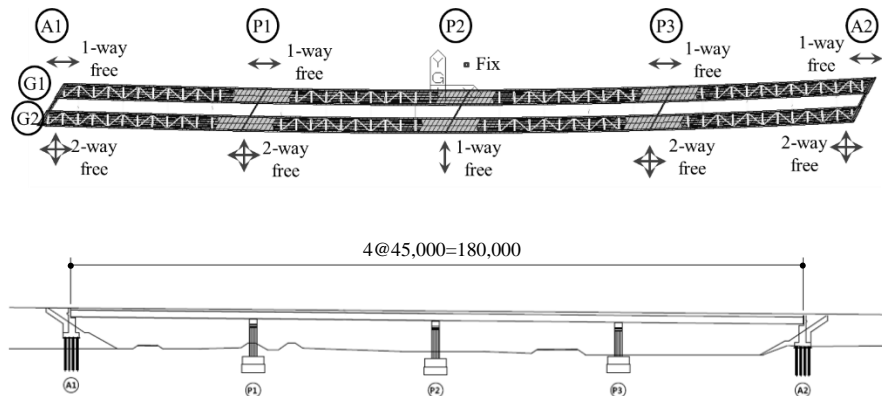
2 Plane and side view of Yeondae Bridge (Kim, 2014)
